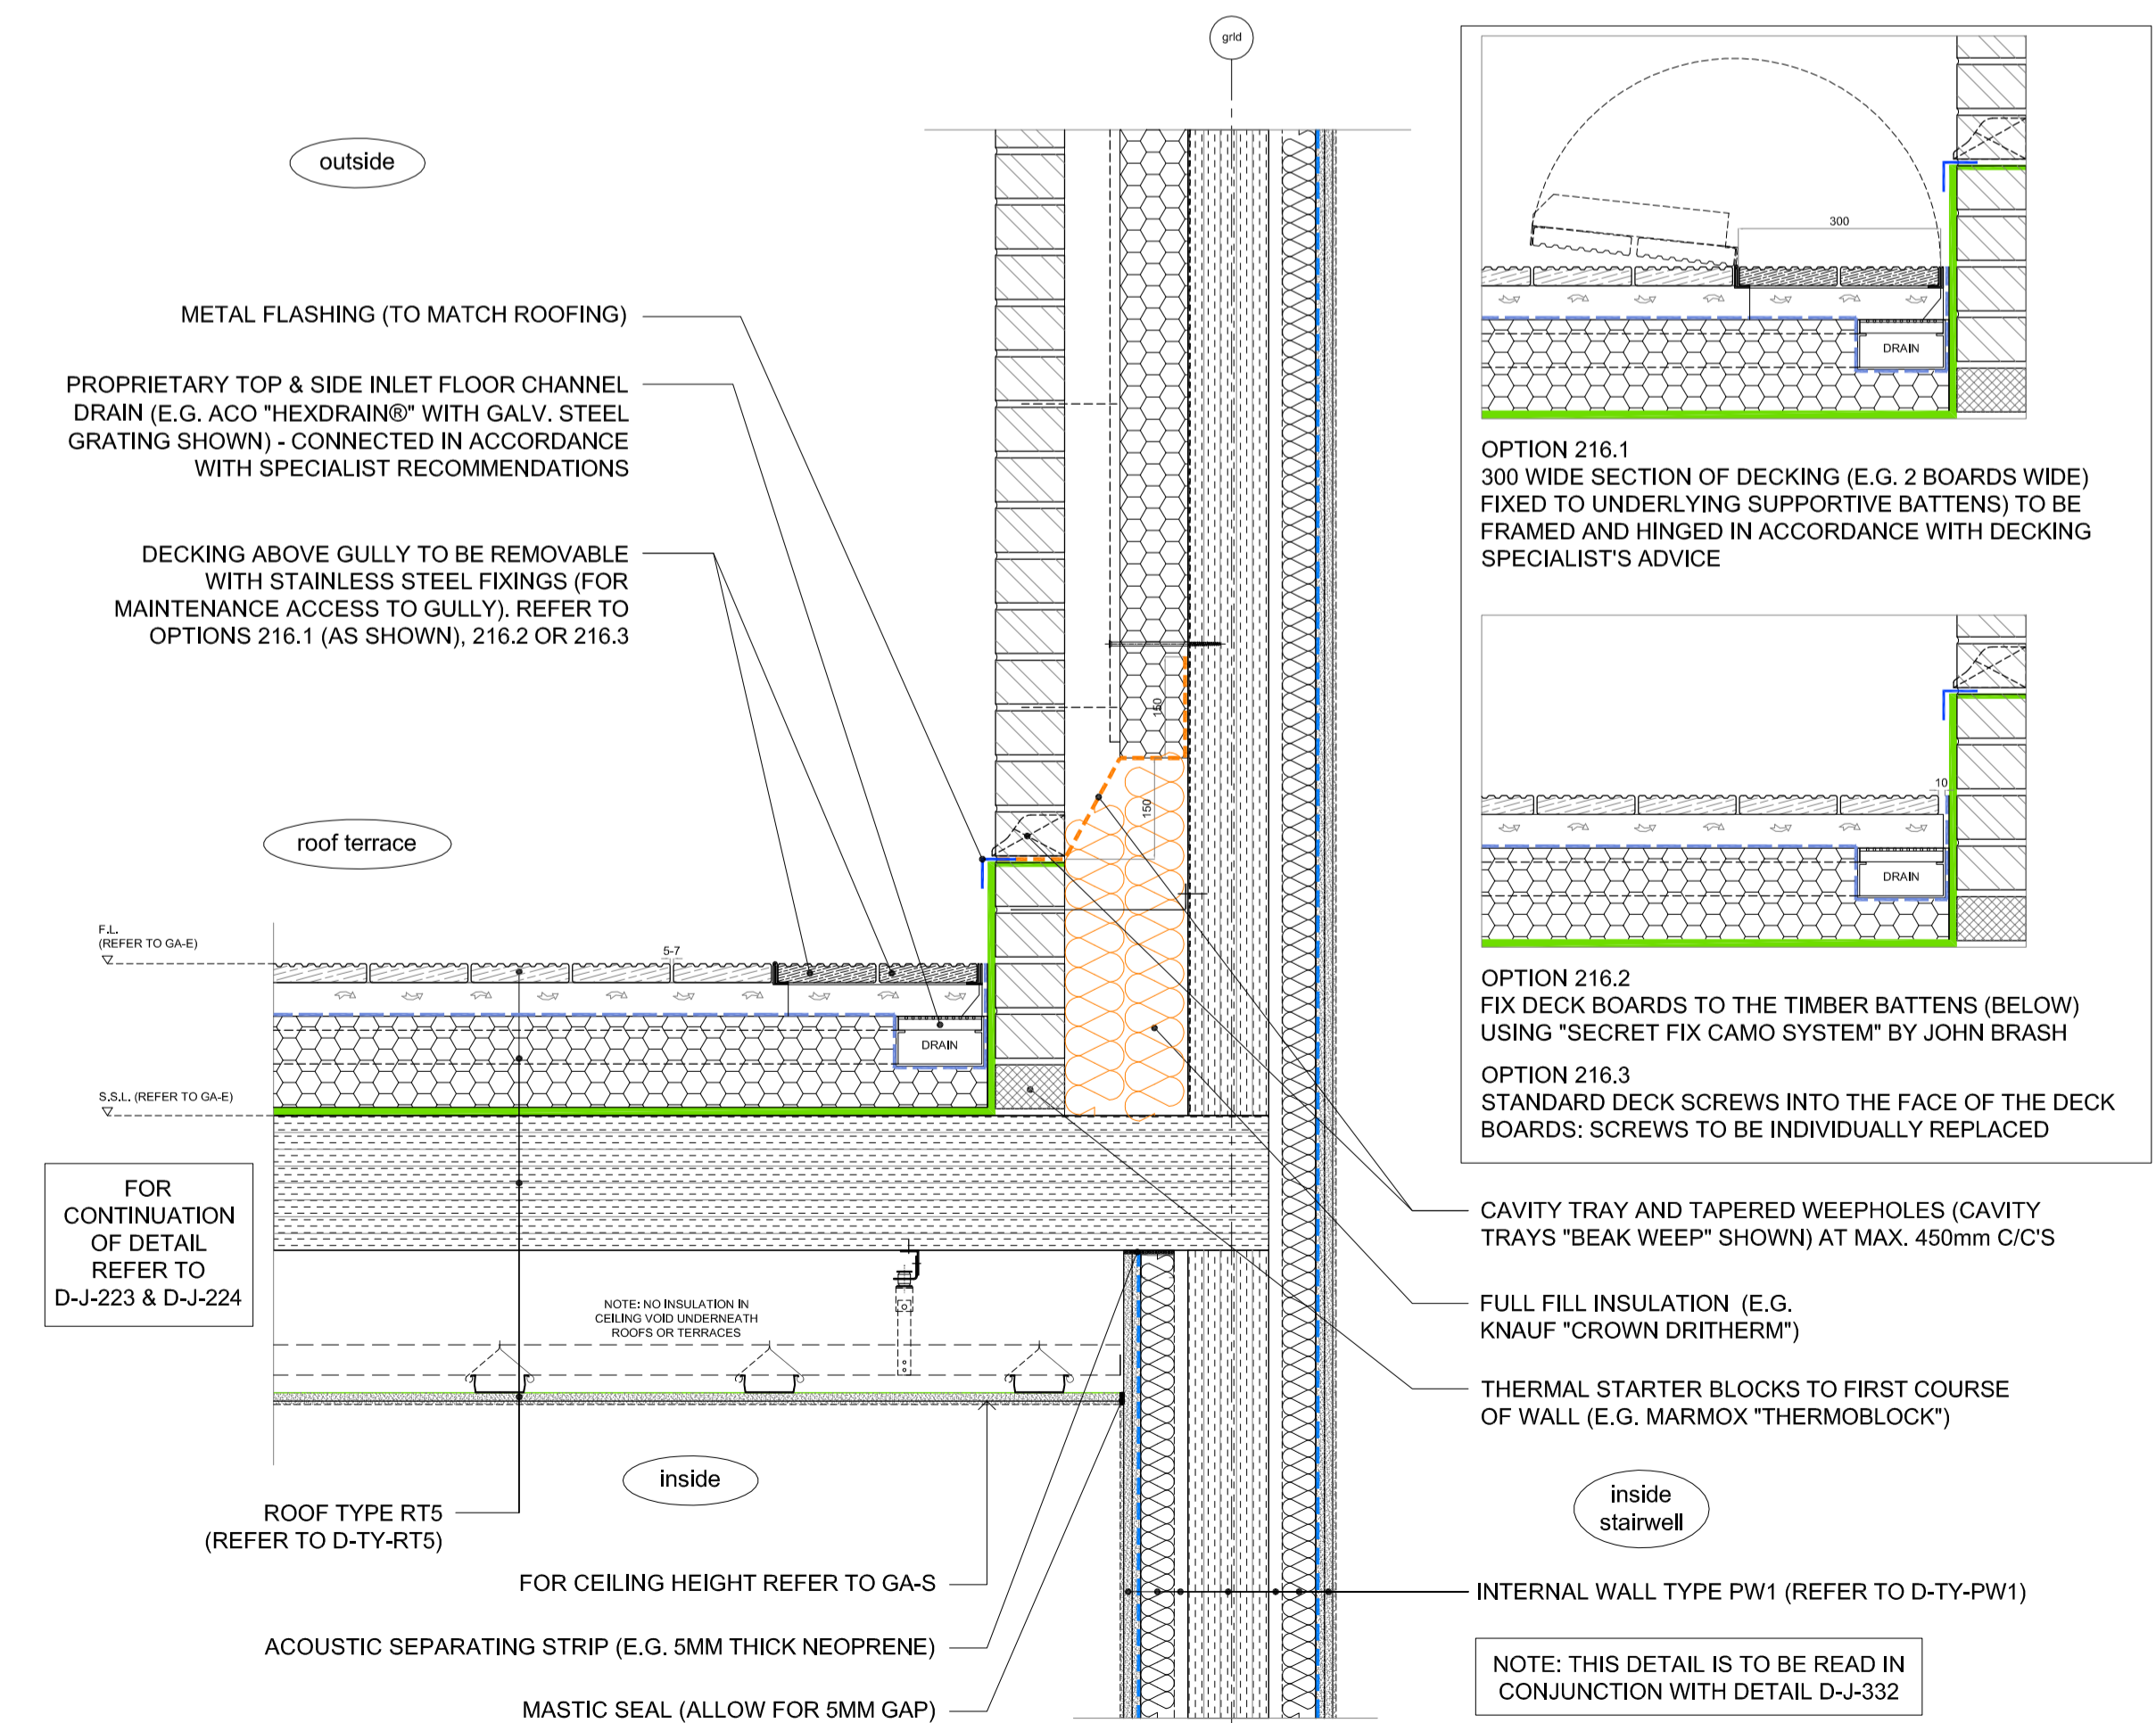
Block A - Green roof / Wall type WT7
